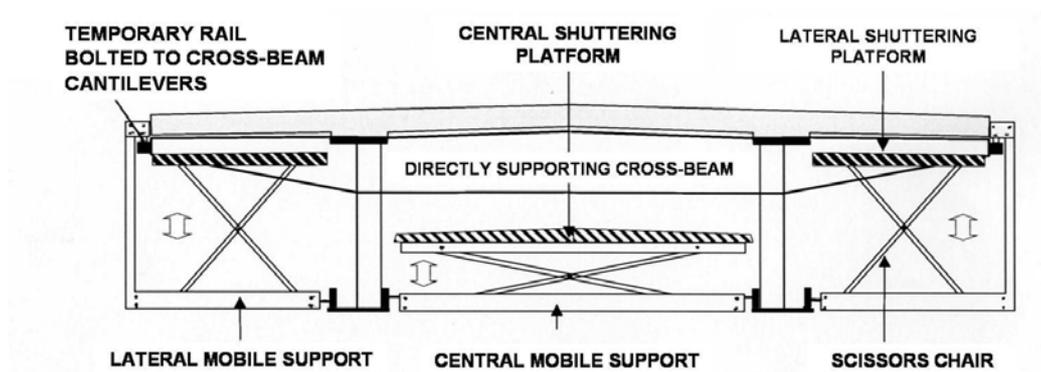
Mobile formwork for a deck incorporating directly supporting cross-beams with cantilevers / Example 1
